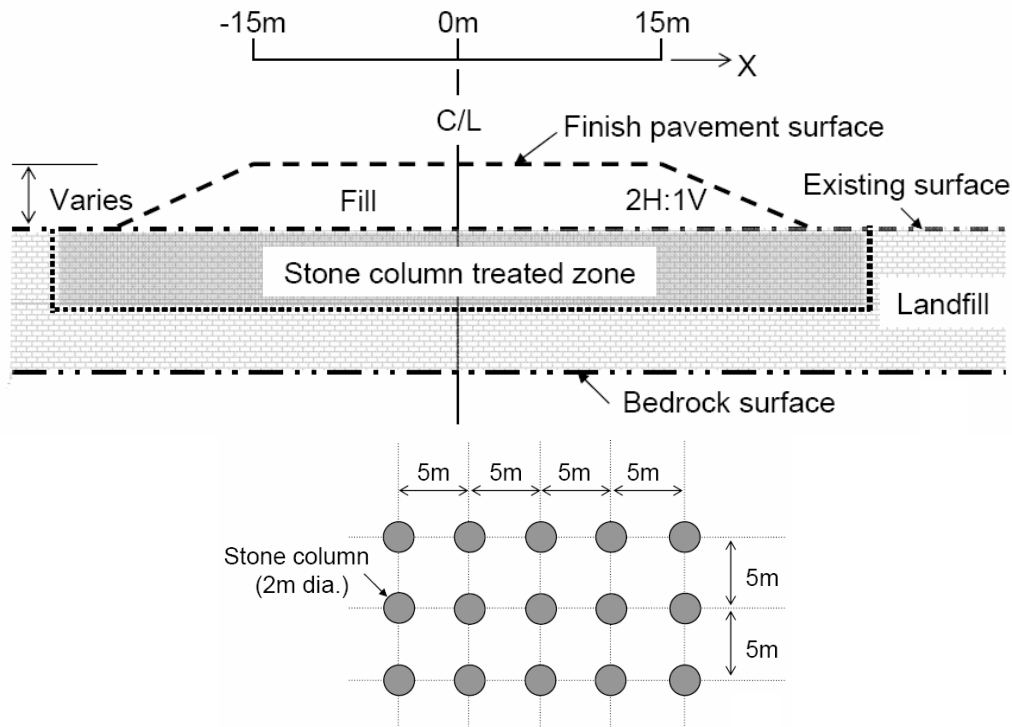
Typical cross section and arrangement of DC/DR treatment.
